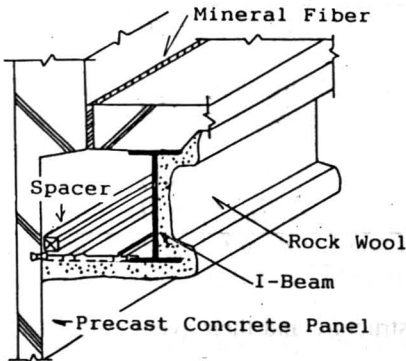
Details of Precast Concrete panel and Rock Wool Composite Fire Protection.
